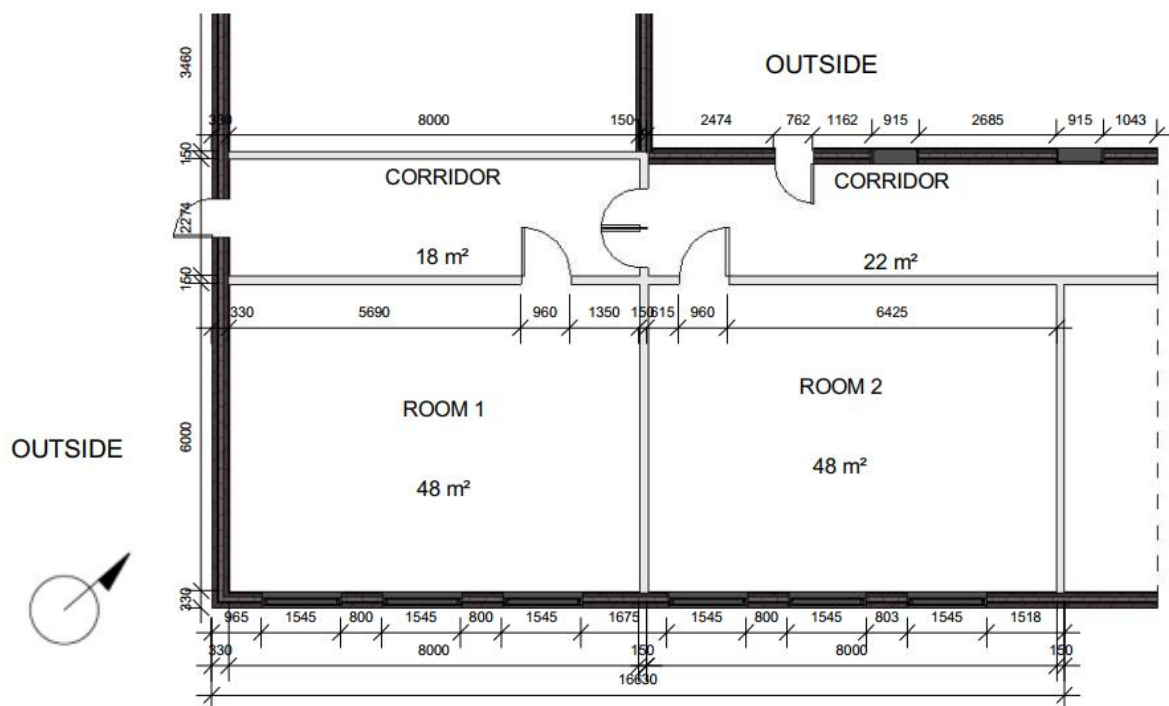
Floor plan of the two rooms with ventilated windows installed and their orientation (Bonet Arbos et al., 2019)
